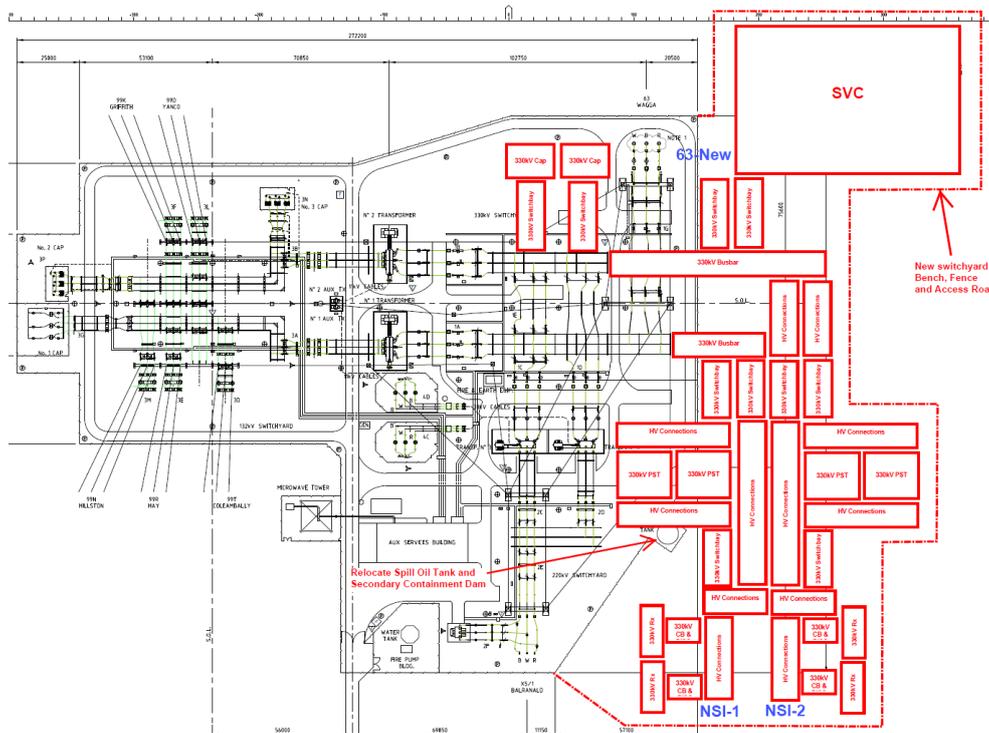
d – Proposed Darlington Point Substation General Arrangement
